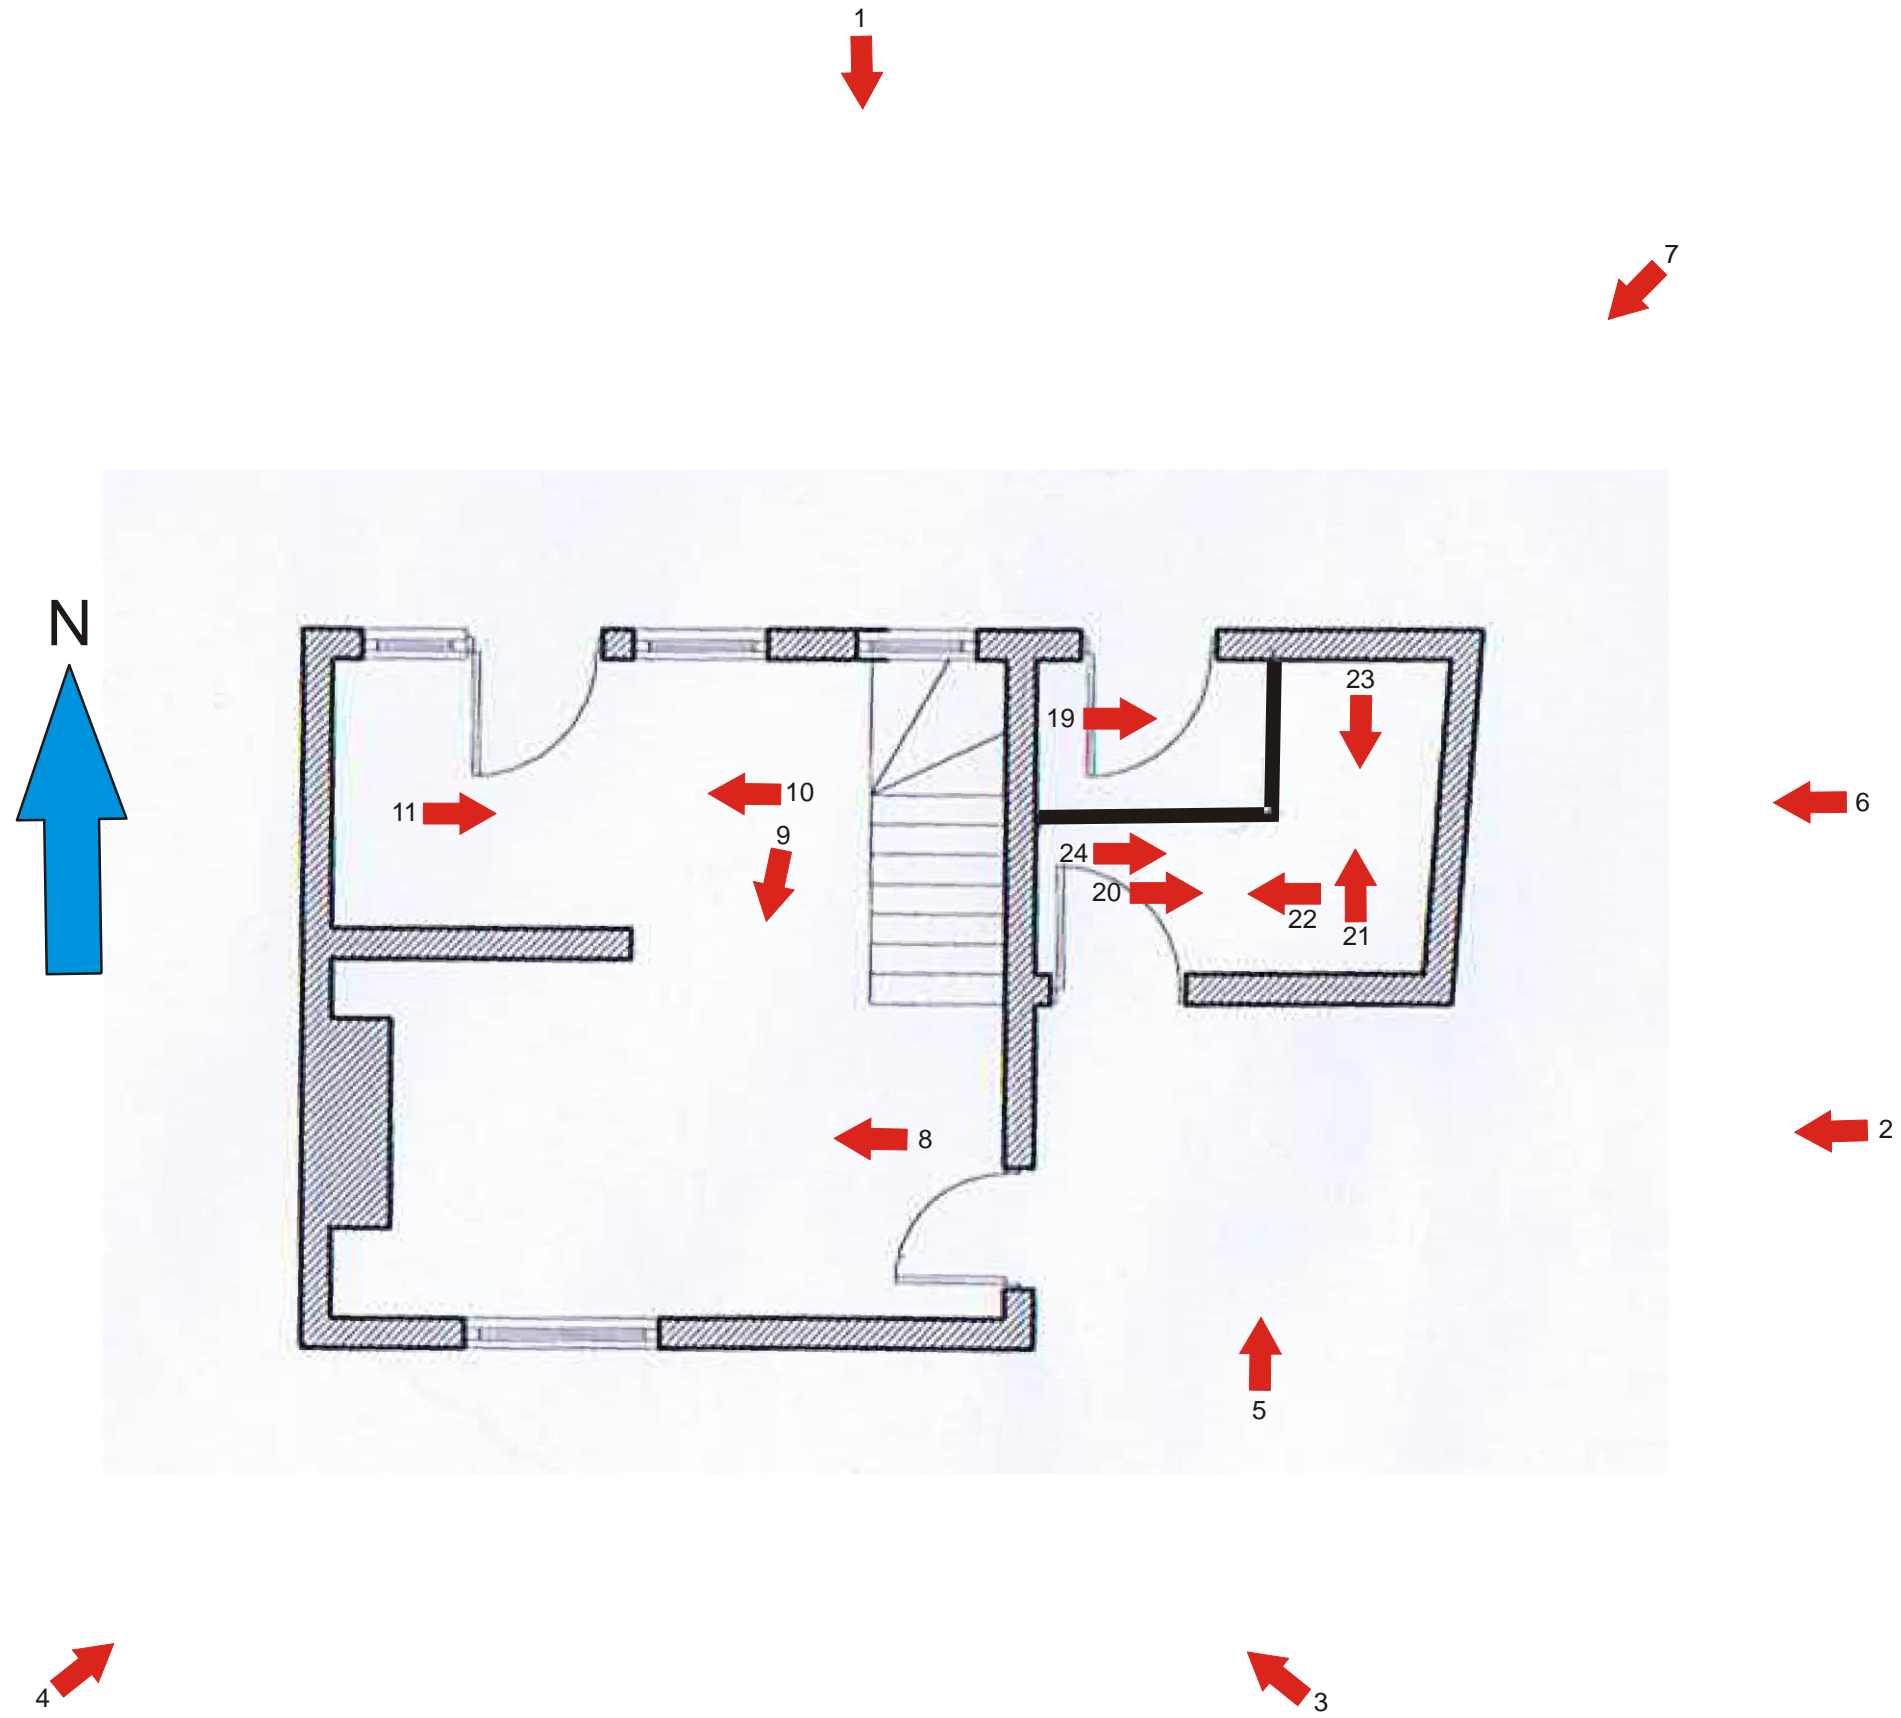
Ground Floor Plan of 9, Apiary Gate & Side Extension showing the locations from which the Phase 1 photographic record was taken
